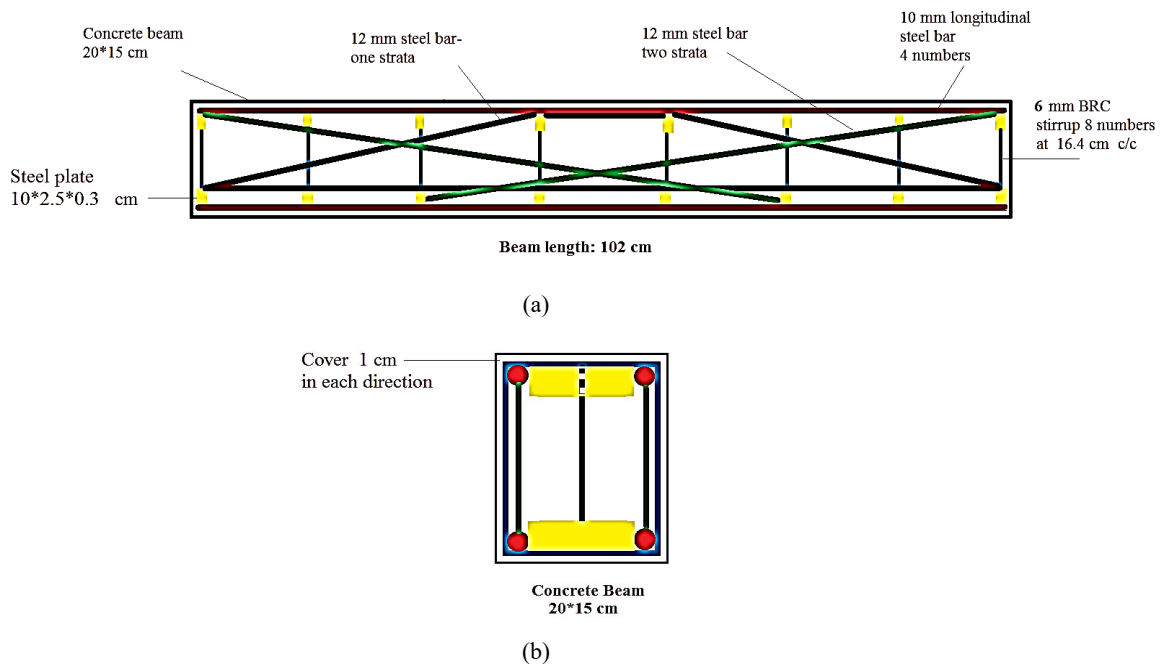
Details of the invented reinforcement system. (a) Longitudinal section of the invented reinforcement; (b) Cross-section of the invented reinforcement.
